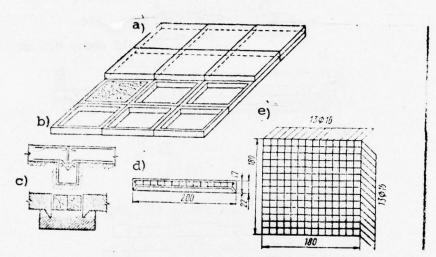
Prefab-reusable reinforced concrete surface made from a frame and supported on its slabs:
